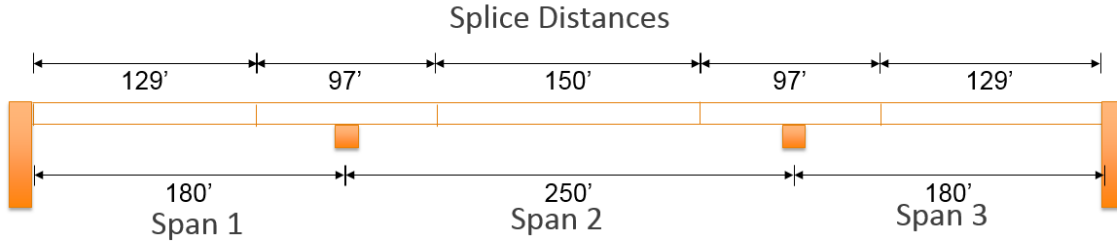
IH 35 UPRR Ramp Elevation View Drawing
